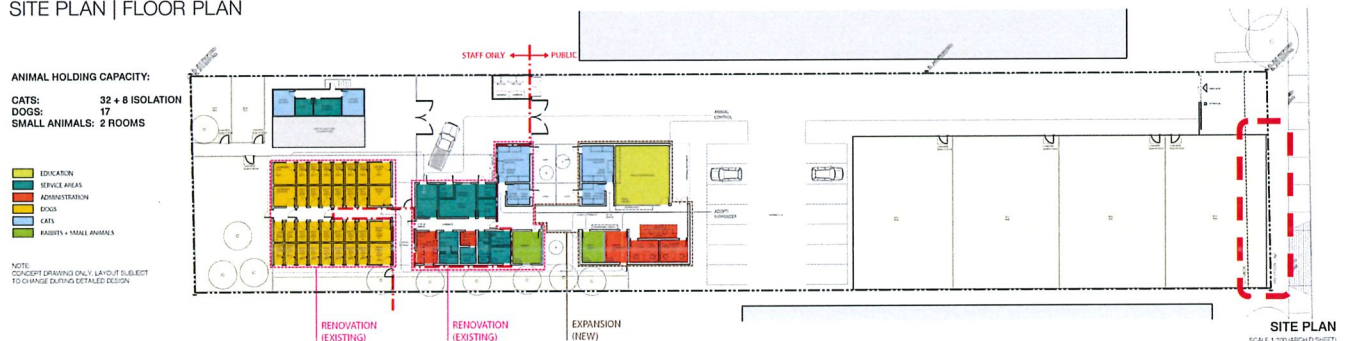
Site Plan of Richmond Animal Shelter Renovation and Expansion. Proposed location of the public artwork is indicated by the red dashed rectangle at the eastern edge of the dog run perimeter fence, parallel to No.5 Road.
